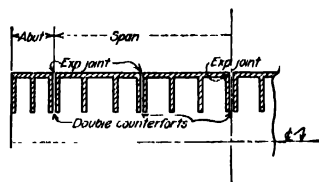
Expansion joints in counterforted spandrel walls. (Plan view.)
